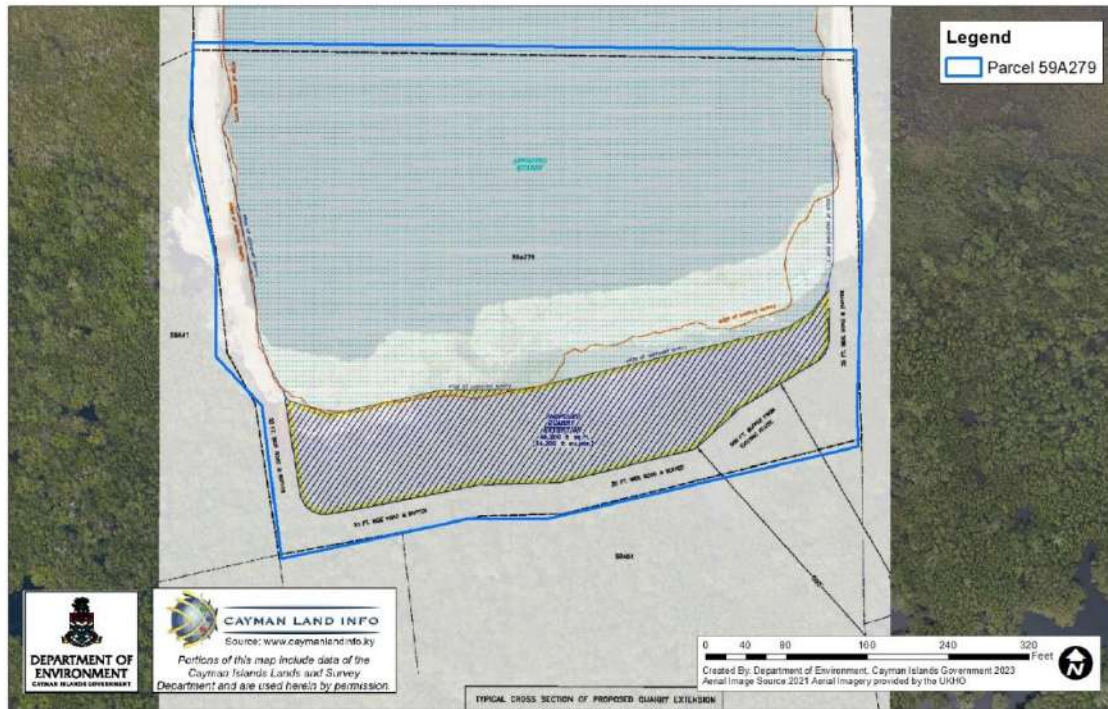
The application site with the parcel boundary highlighted in blue and an overlay of the submitted modification plans (Aerial Imagery Source: UKHO, 2021 & Architectural Plans Source: Steve Madramootoo, 2024).
